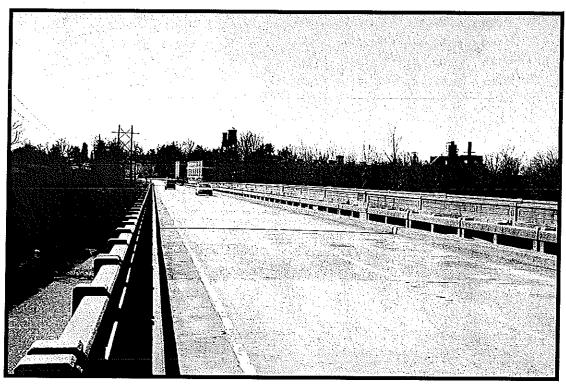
Looking north at roadway and railings of US 29/70 Bridge No. 2; parapet walls of Wilcox Bridge to right and North Carolina Finishing Company in distance.
